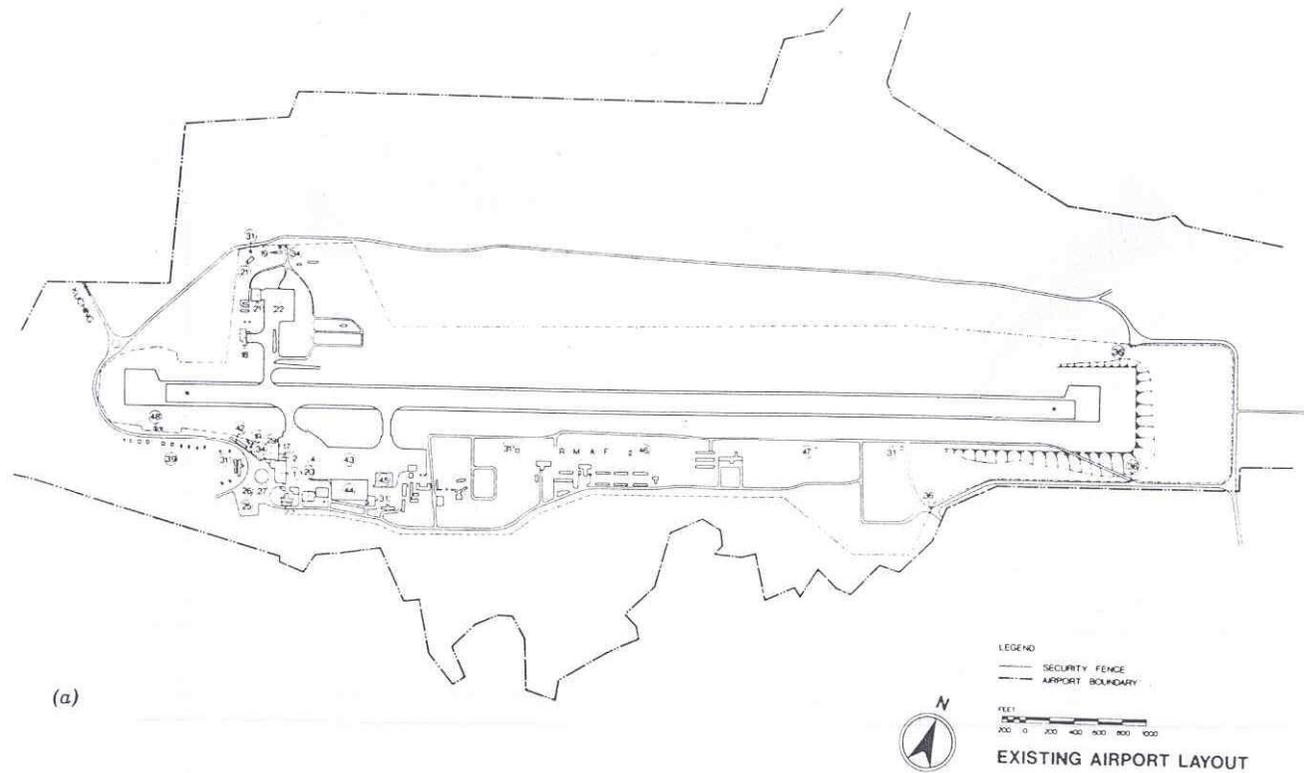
Example of airport layout plan—current facilities. (Source: Malaysian Associate Architects and Sir Frederick Snow and Partners by permission of Department of Public Works, East Malaysia)
